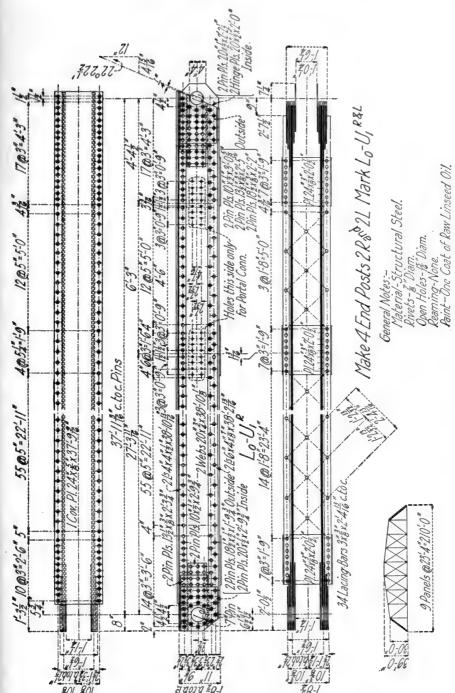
MARKING DIAGRAM FOR TRUSS BRIDGE.
